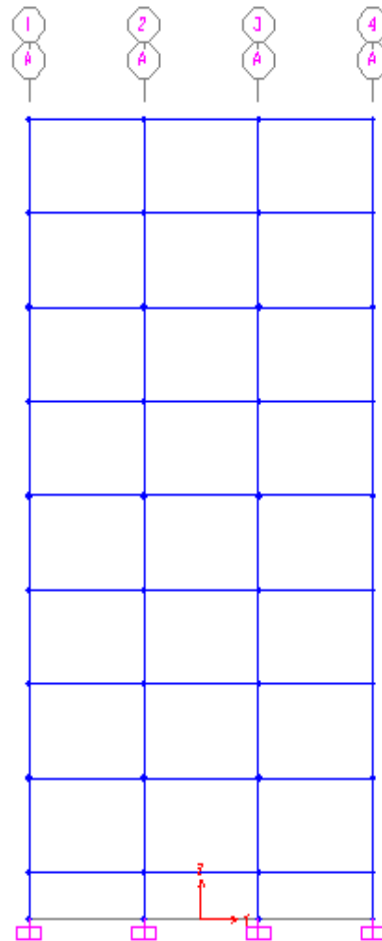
Elevation of 1-4 frames of 8 storied RC Building
